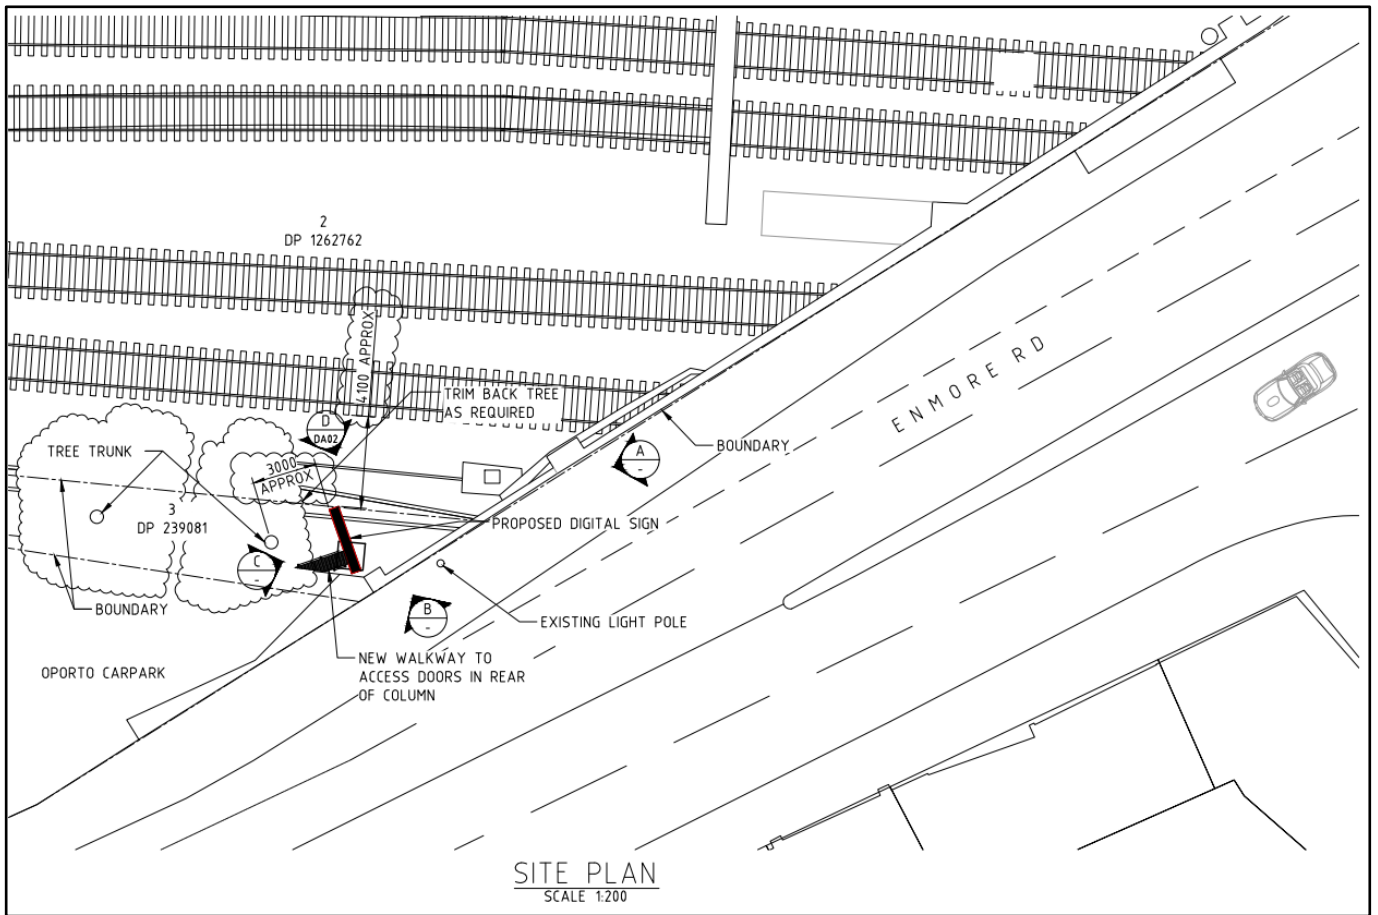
| Site Plan (Source: Dennis Bunt Consulting Engineers)
